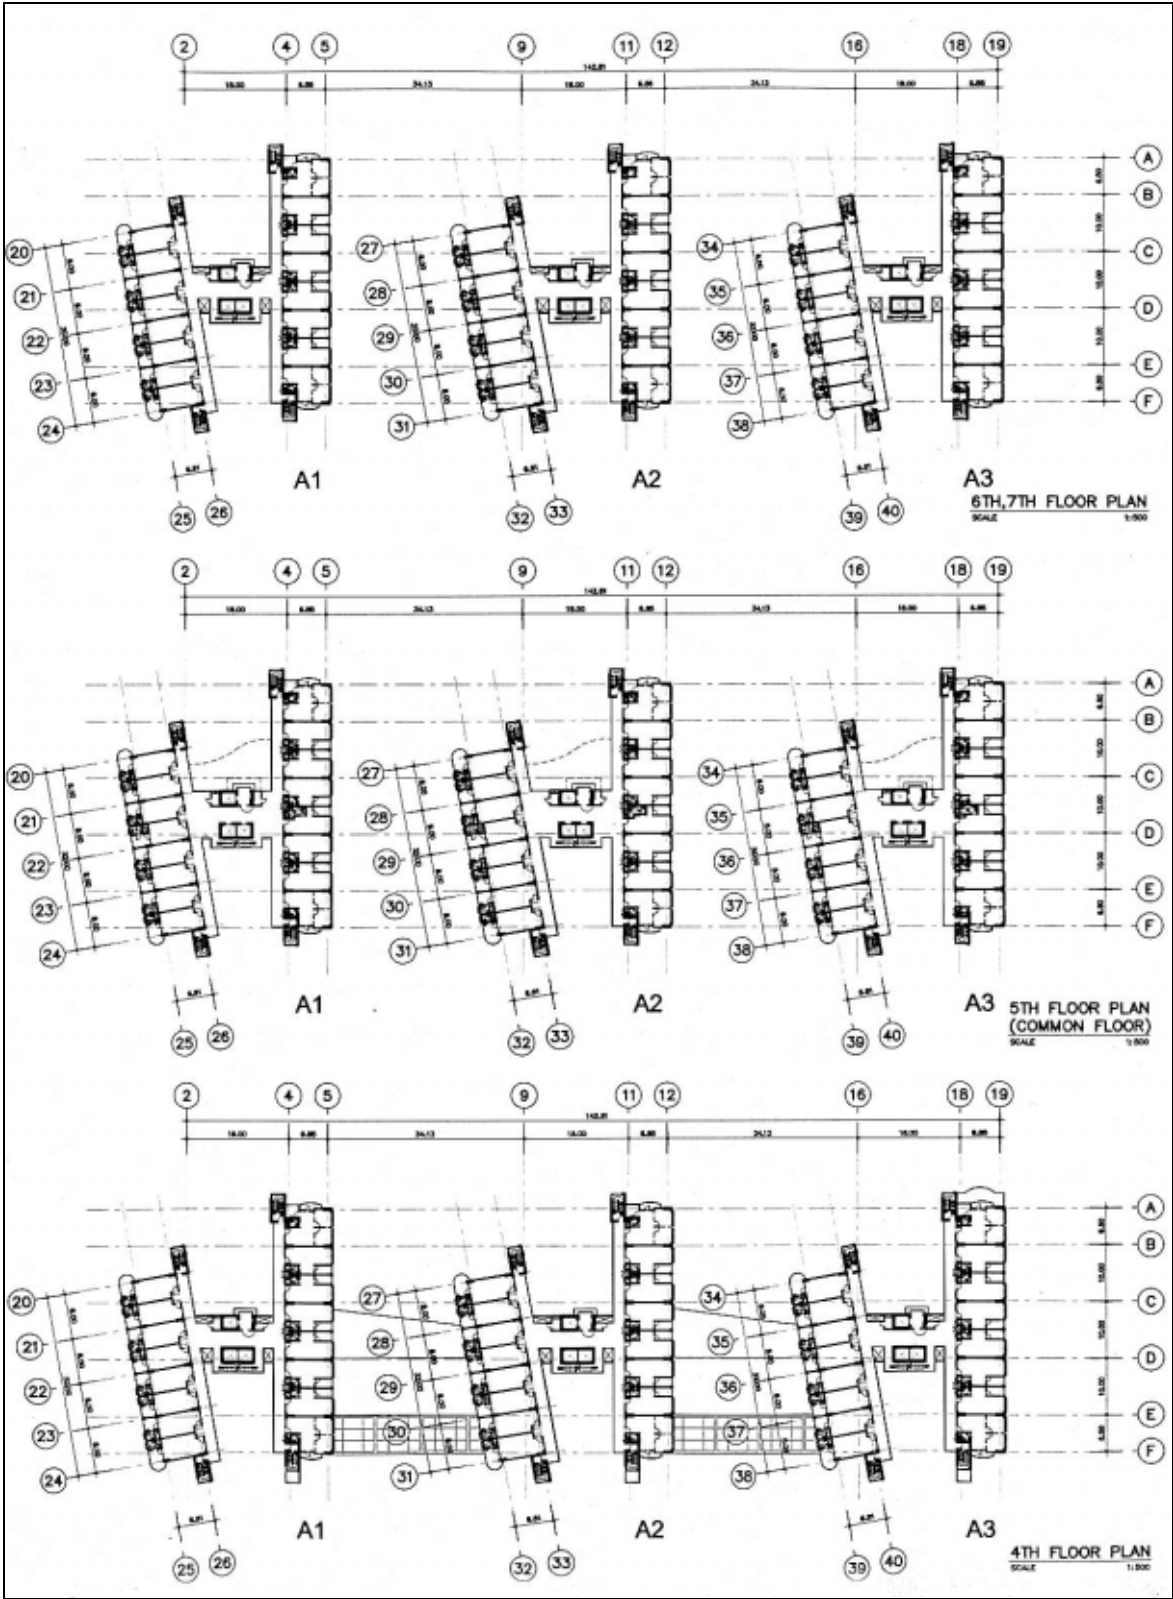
Building Layout Plan at Site-A (4TH Floor ~ 7TH Floor)
